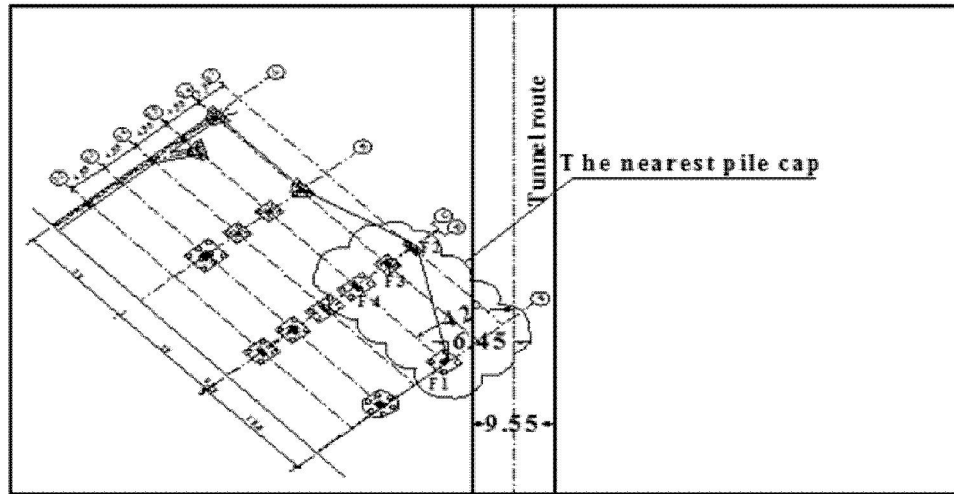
Location of the nearest pile caps relative to the tunnel route
